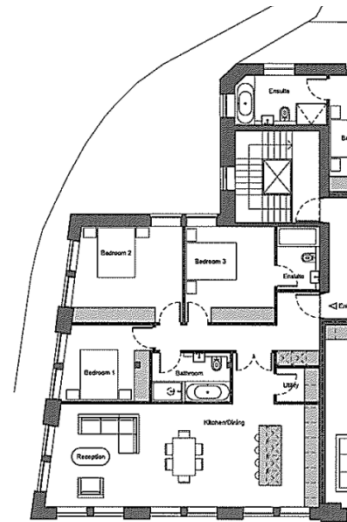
(above): Flat at floors 1-4 of Linton House adjacent to proposal
